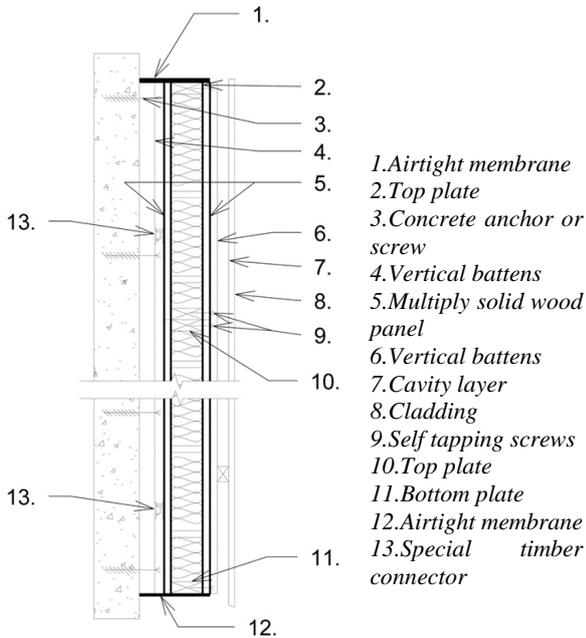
Vertical cross section, rehabilitation of concrete wall with the patented modular wall system
